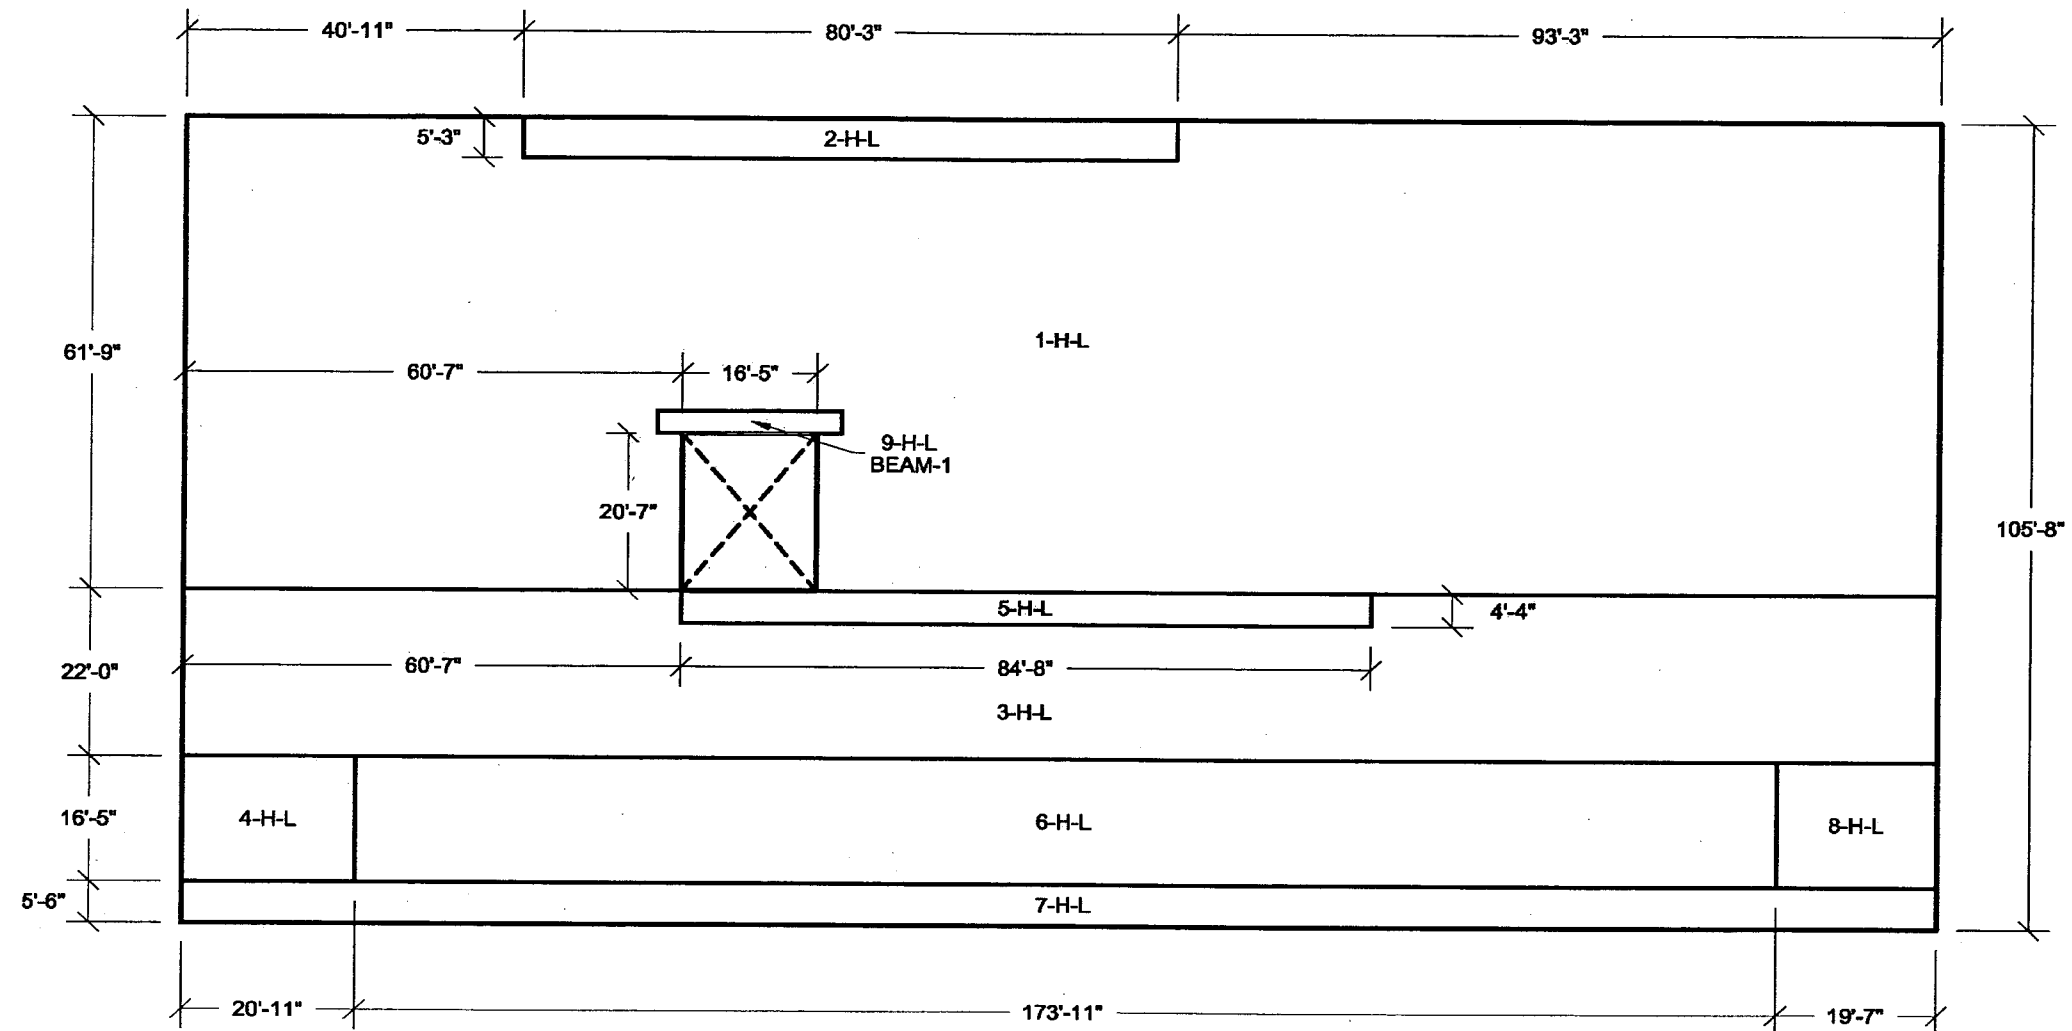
H.3-13: SOUTH WALL LOOKING NORTH
